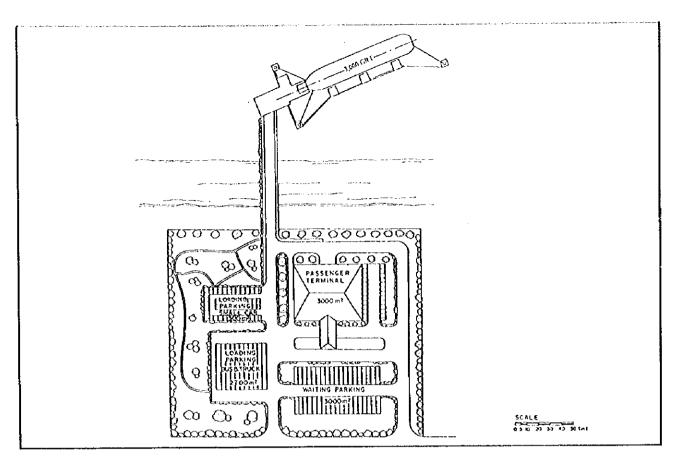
General Layout Plan of Ferry Terminal (3,000 GRT)
